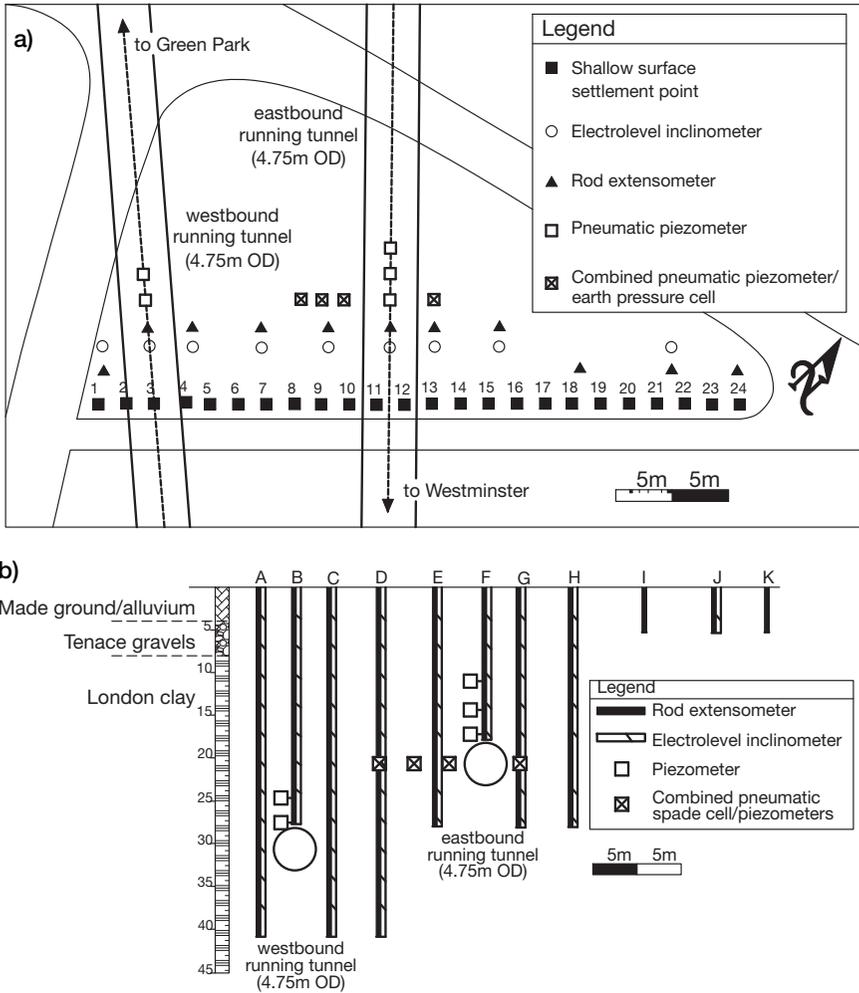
An example of the instrumentation used to monitor the ground behaviour resulting from a bored tunnel as part of the Jubilee Line Extension project on the London Underground, UK, a) site plan, and b) instrumented cross section (after Standing *et al.* 1996)
